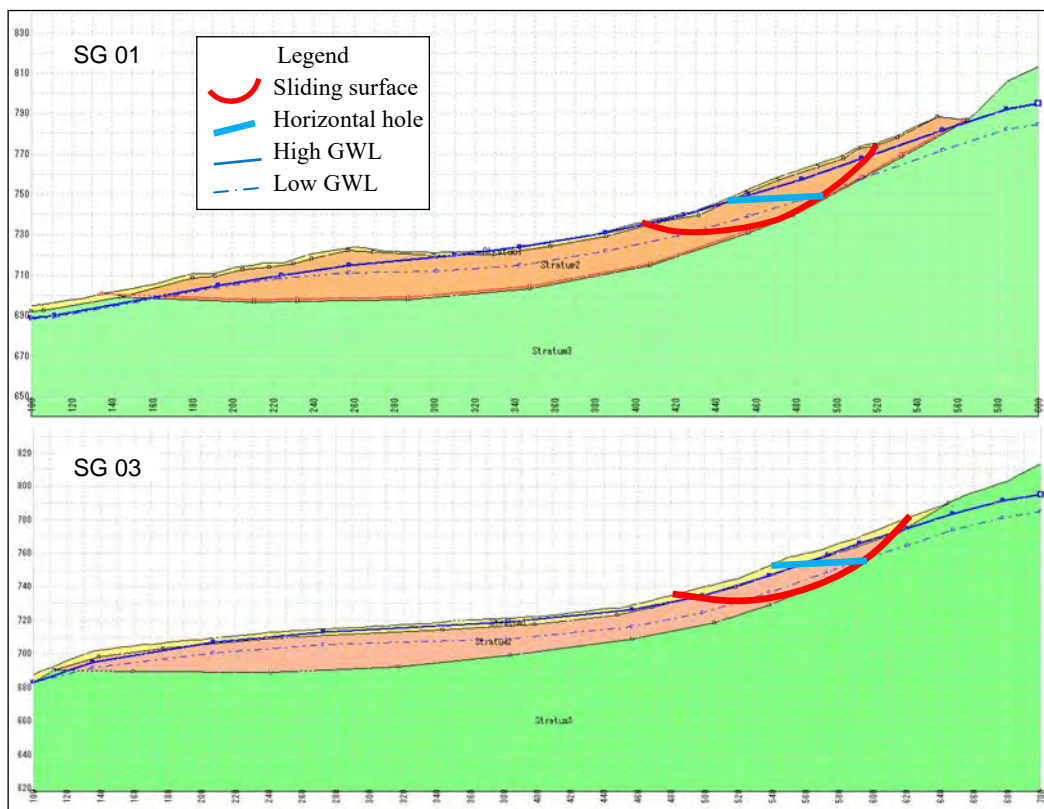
Possible locations of horizontal holes for Getahovit site on sections
